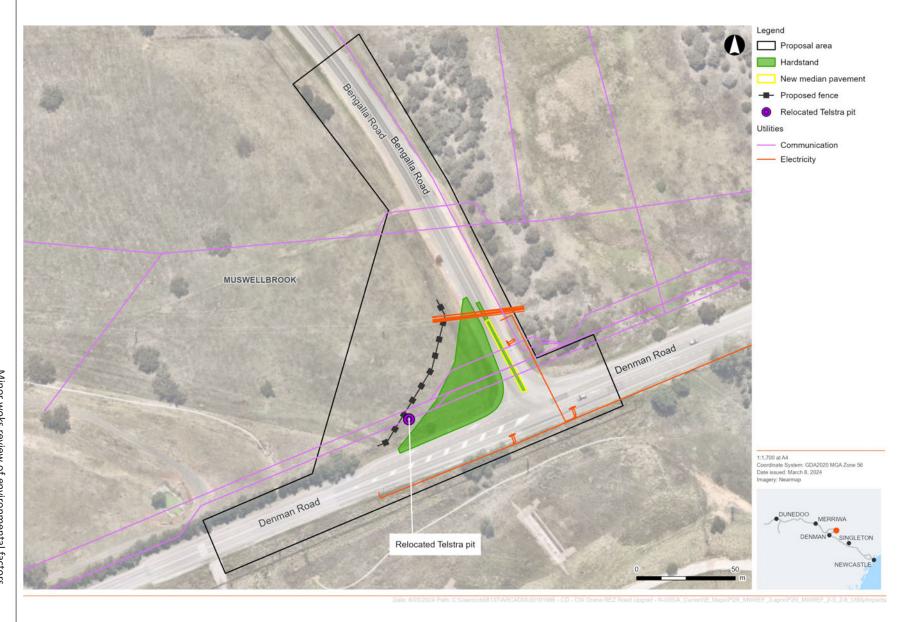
Utility impacts – Denham Road and Bengalla Road intersection (I-026)
